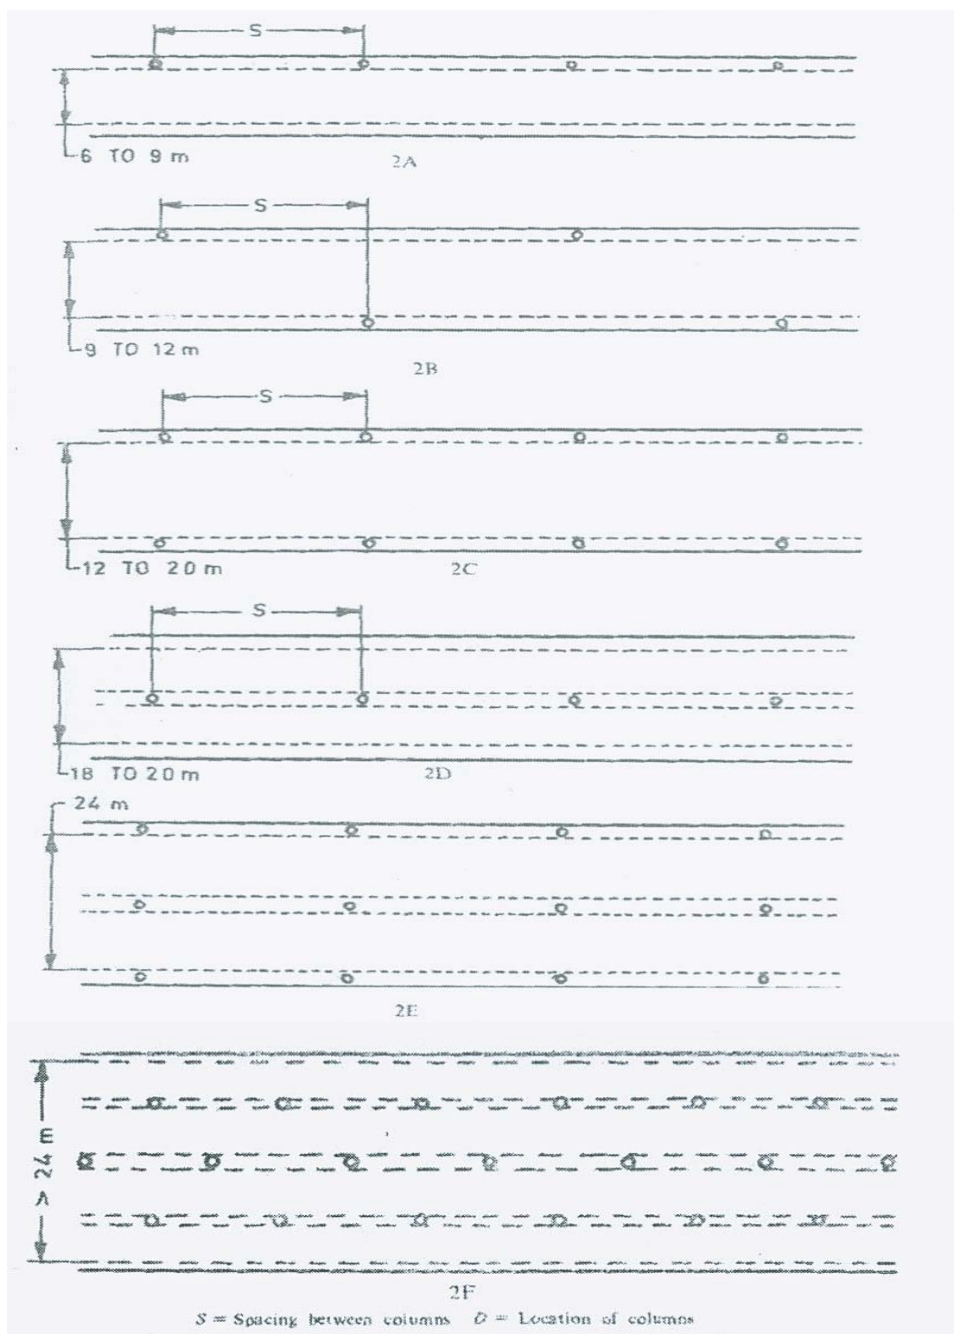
Standard Lighting Layout for Roads (Six Alternatives)
